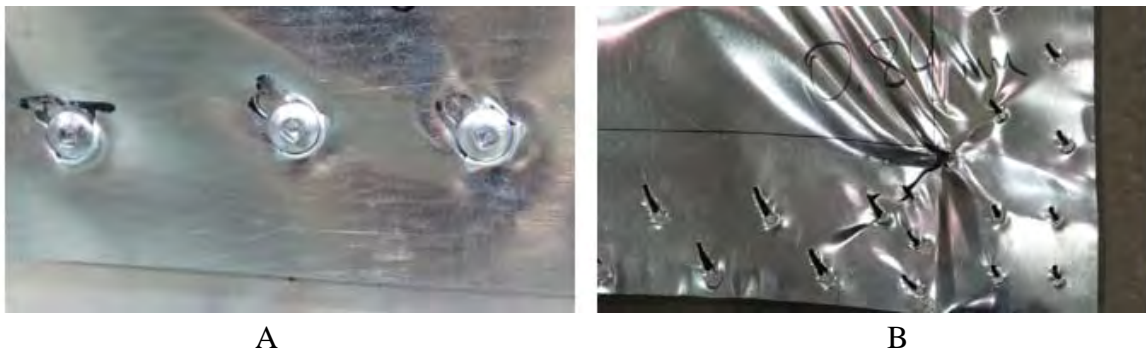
Sheathing bearing failure. A) Double-sheathed specimen. B) Centre-sheathed specimen.
